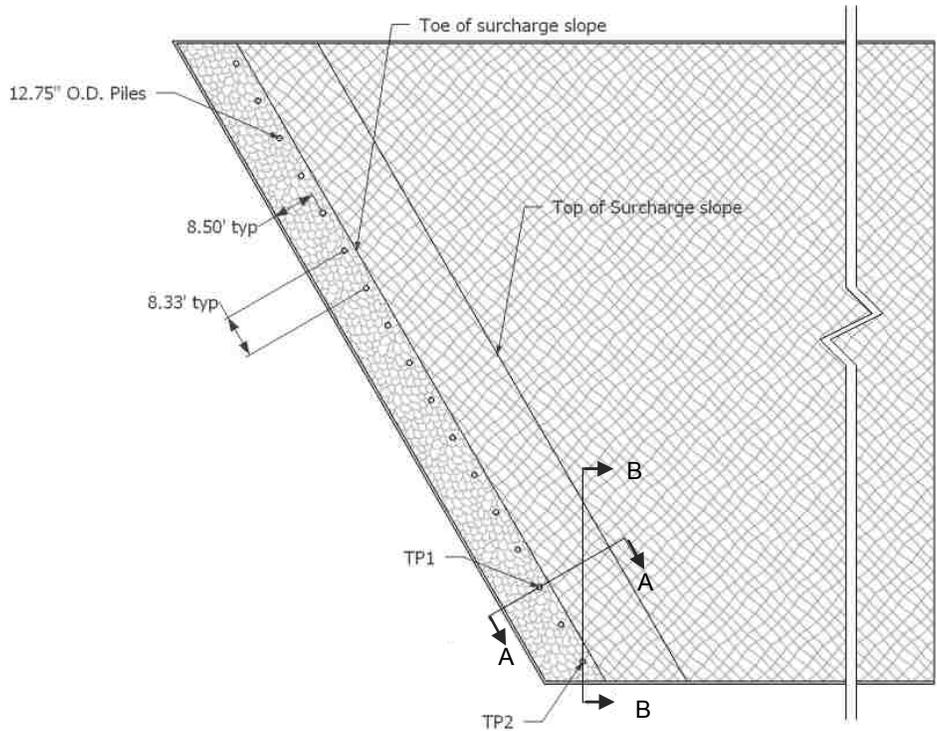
Plan view of the east abutment for the U.S. Highway 89 over UPRR.
